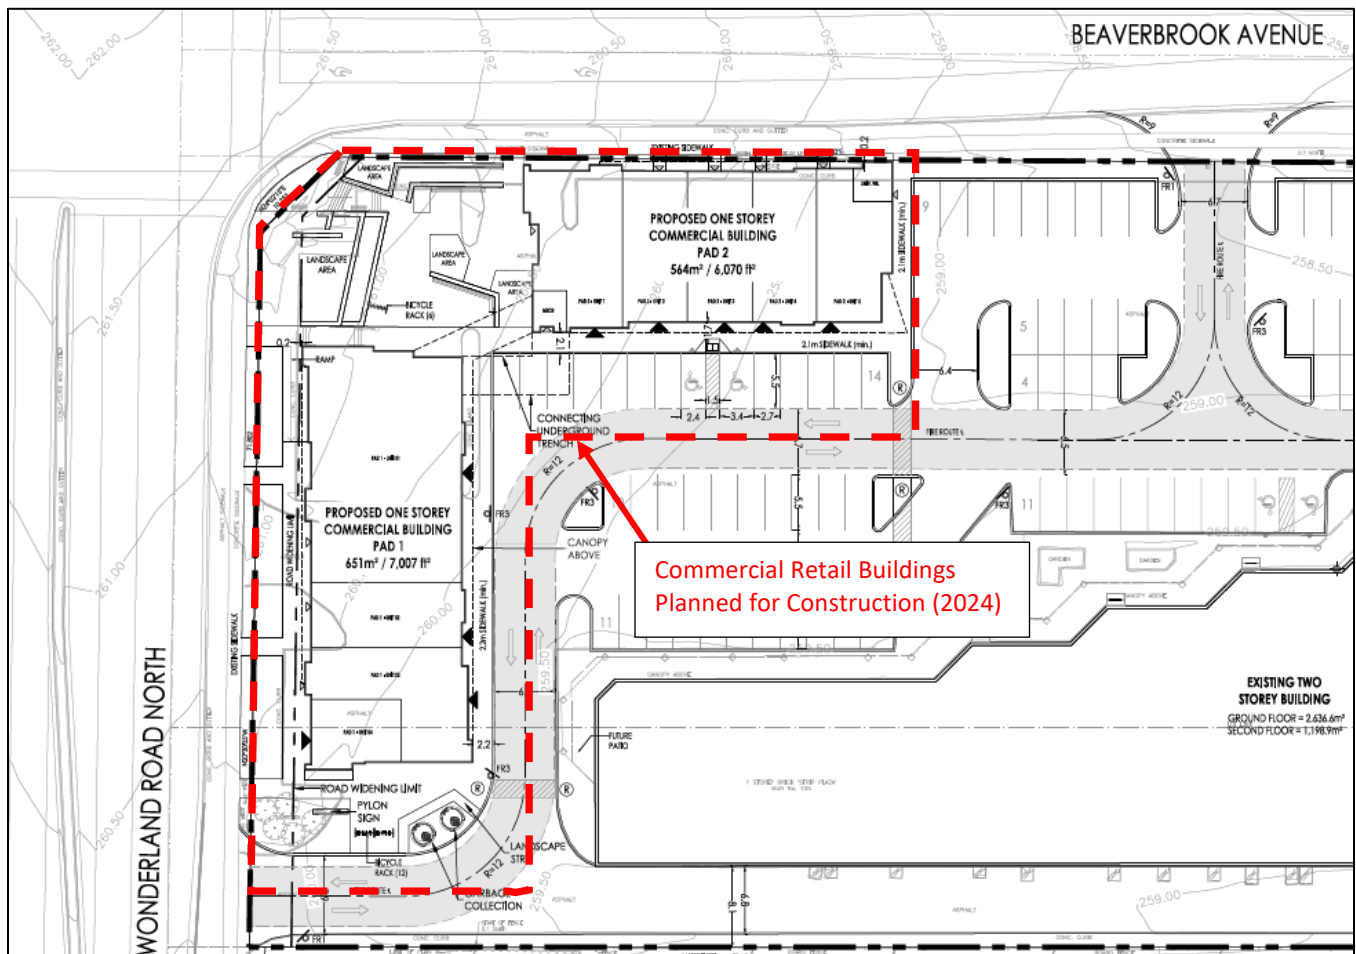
Planned commercial buildings on west side of subject site, currently slated for 2024 construction.
